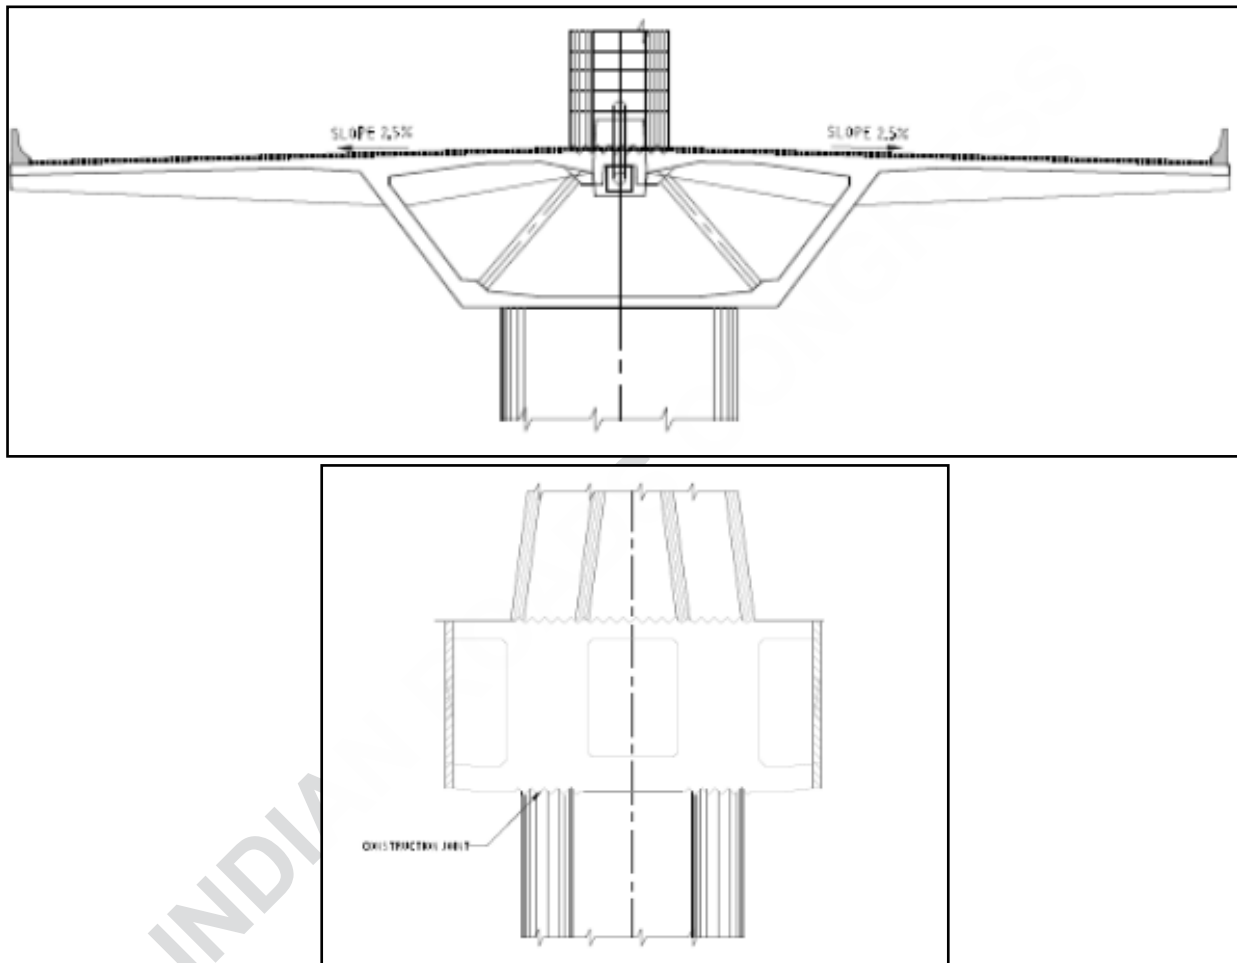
Typical twin leaf lower pylon with cable in central plane
